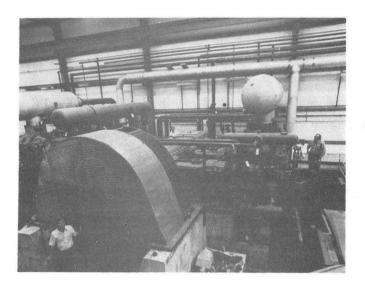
(CBB 831-483). Installation of one of CHL horizontally
